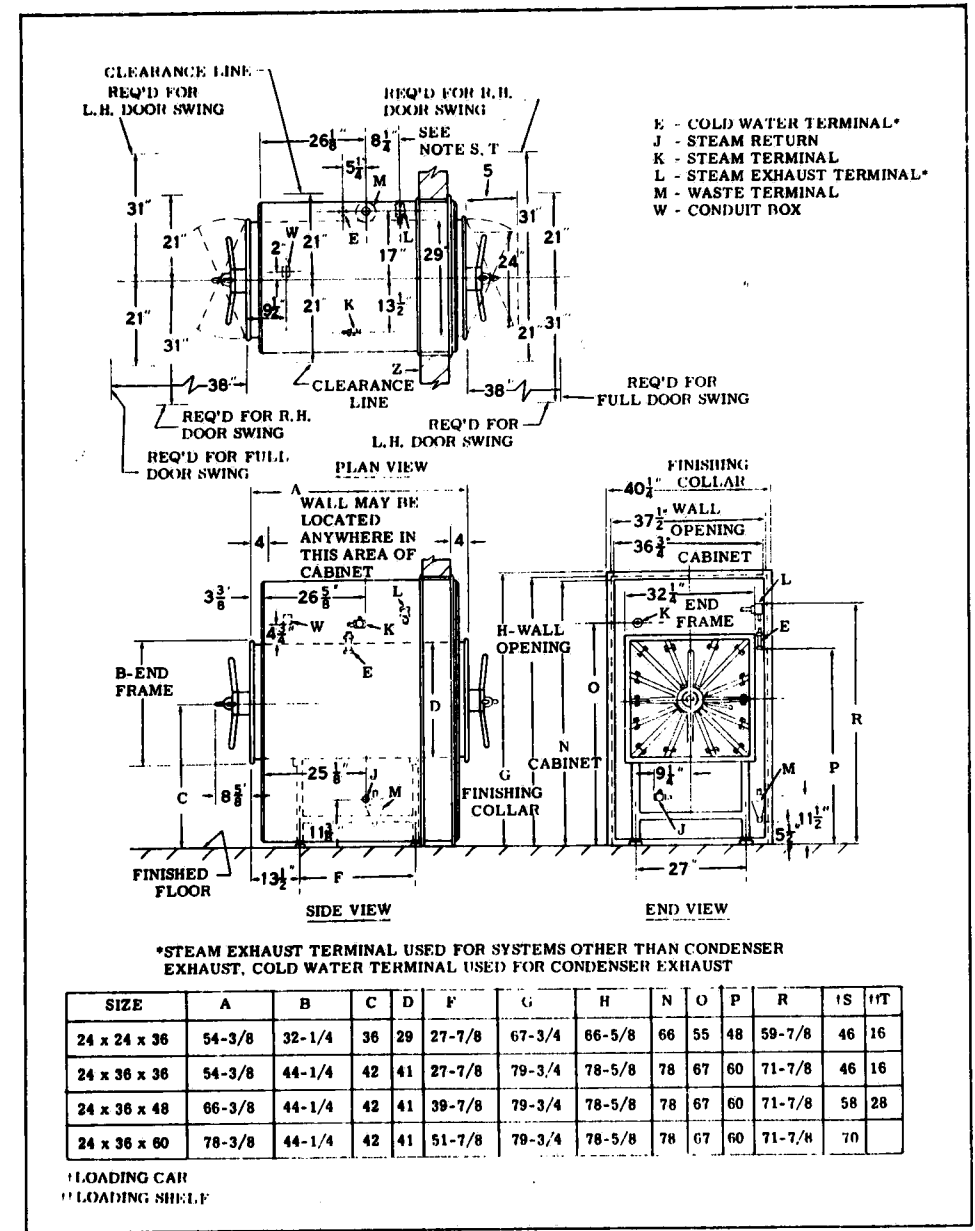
Installation Plan for Cabinet Mounted Double Door Sterilizers
